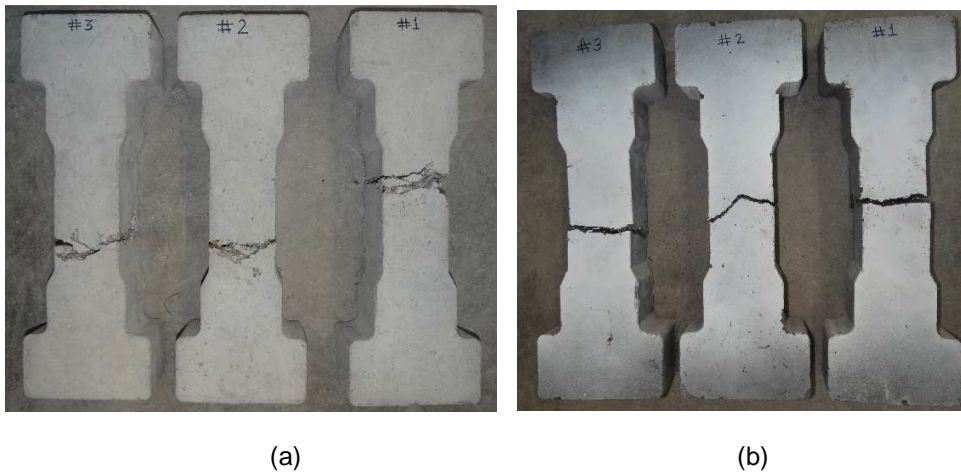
Specimen after testing (a) FRC (b) UHP-FRC
